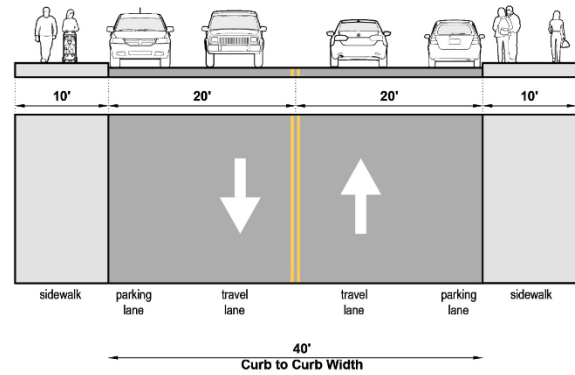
Existing conditions between St. Peter Street and Cedar Street. The segment between Dorothy Day Place and St. Peter Street does not have on-street parking.
